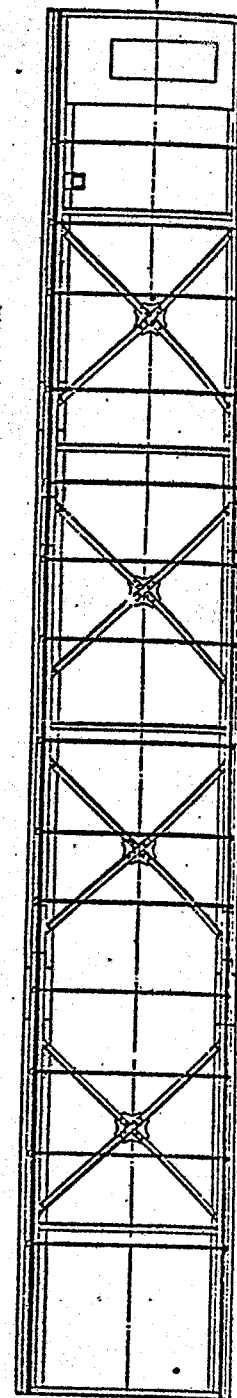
Plan of Bottom of Furnace, showing Heating.
